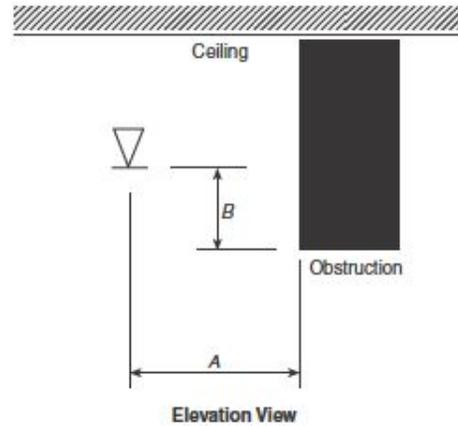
(a) Positioning of Sprinklers to Avoid Obstructions to Discharge (SSU/SSP).
